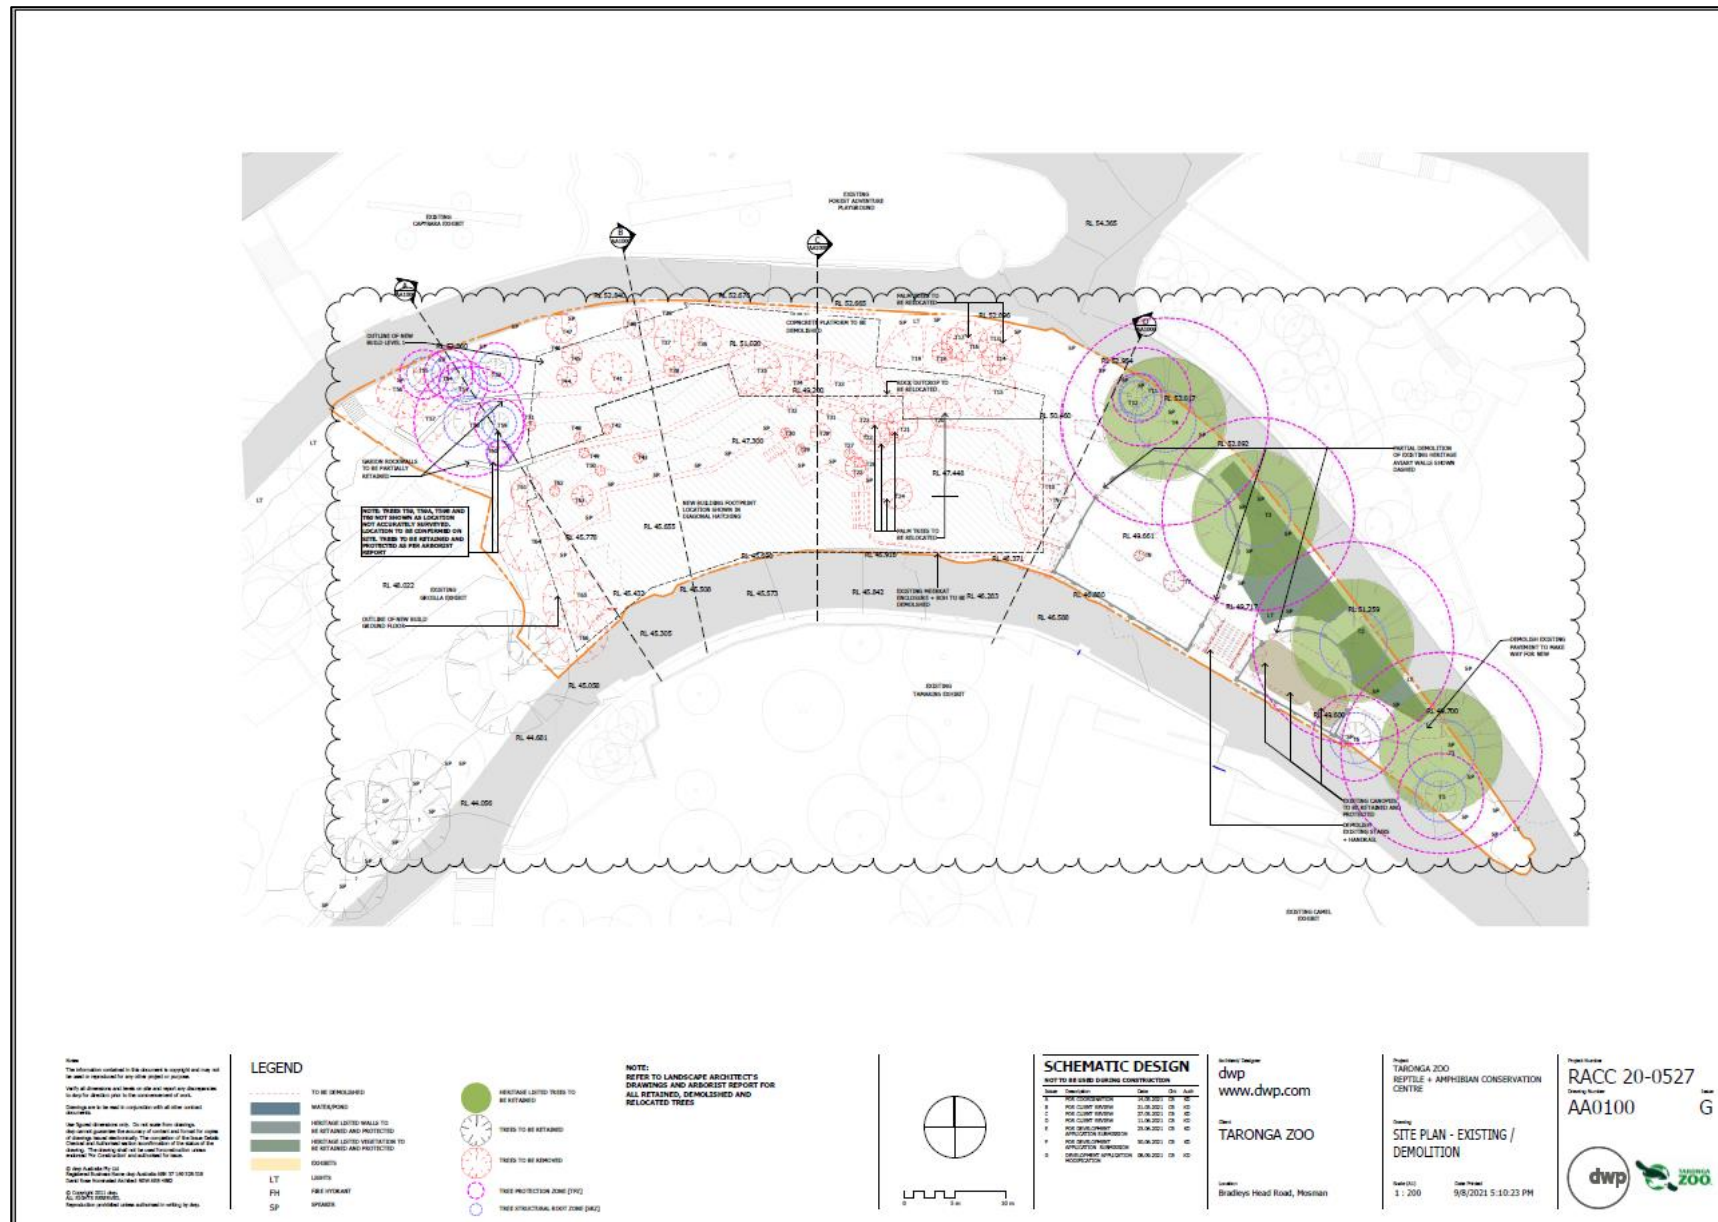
Proposed Site Plan – Existing/Demolition (DWP 2021).
